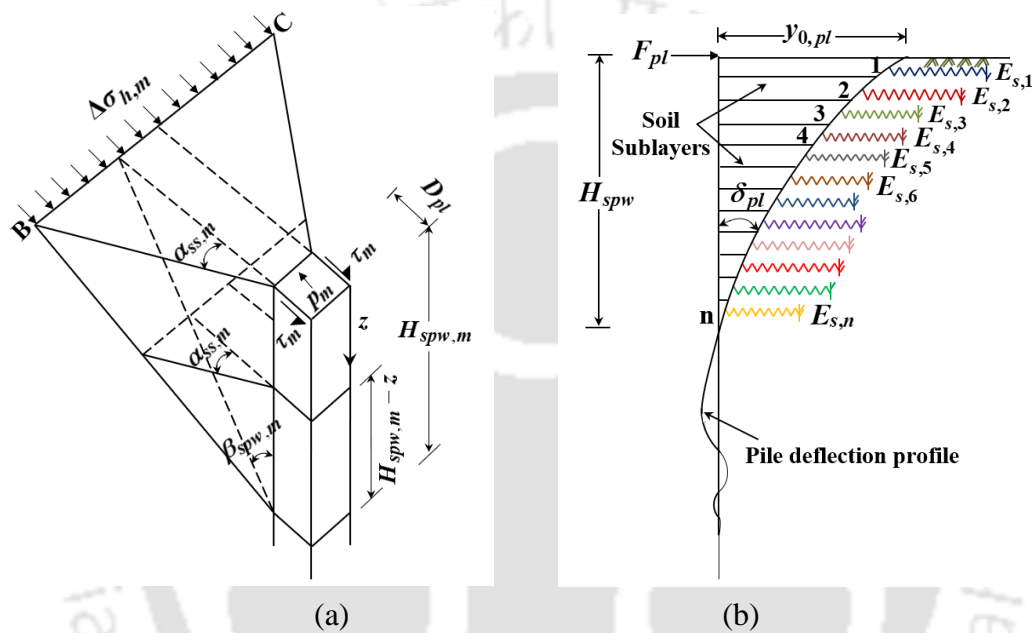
(a) Basic SPW and (b) beam on Winkler foundation approach in SWM (Ashour et al., 1998).
